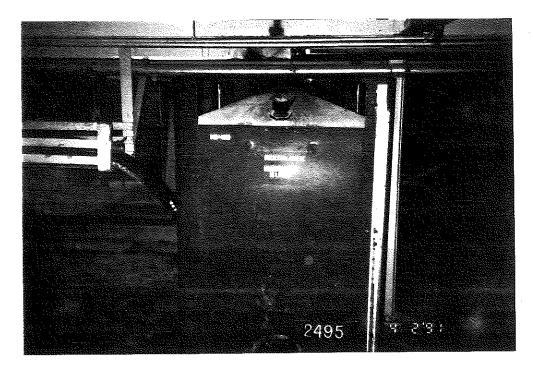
Title: Trench Surrounding Temporary Product Storage Tanks
